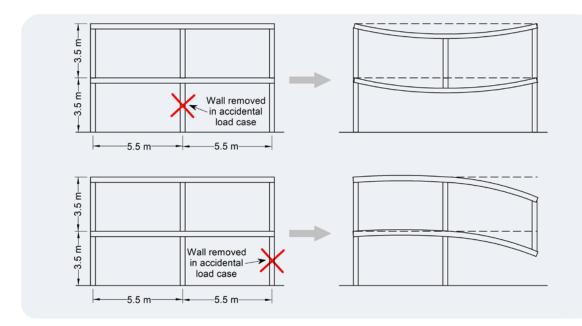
Removal of load-bearing wall in a platform-type building.
